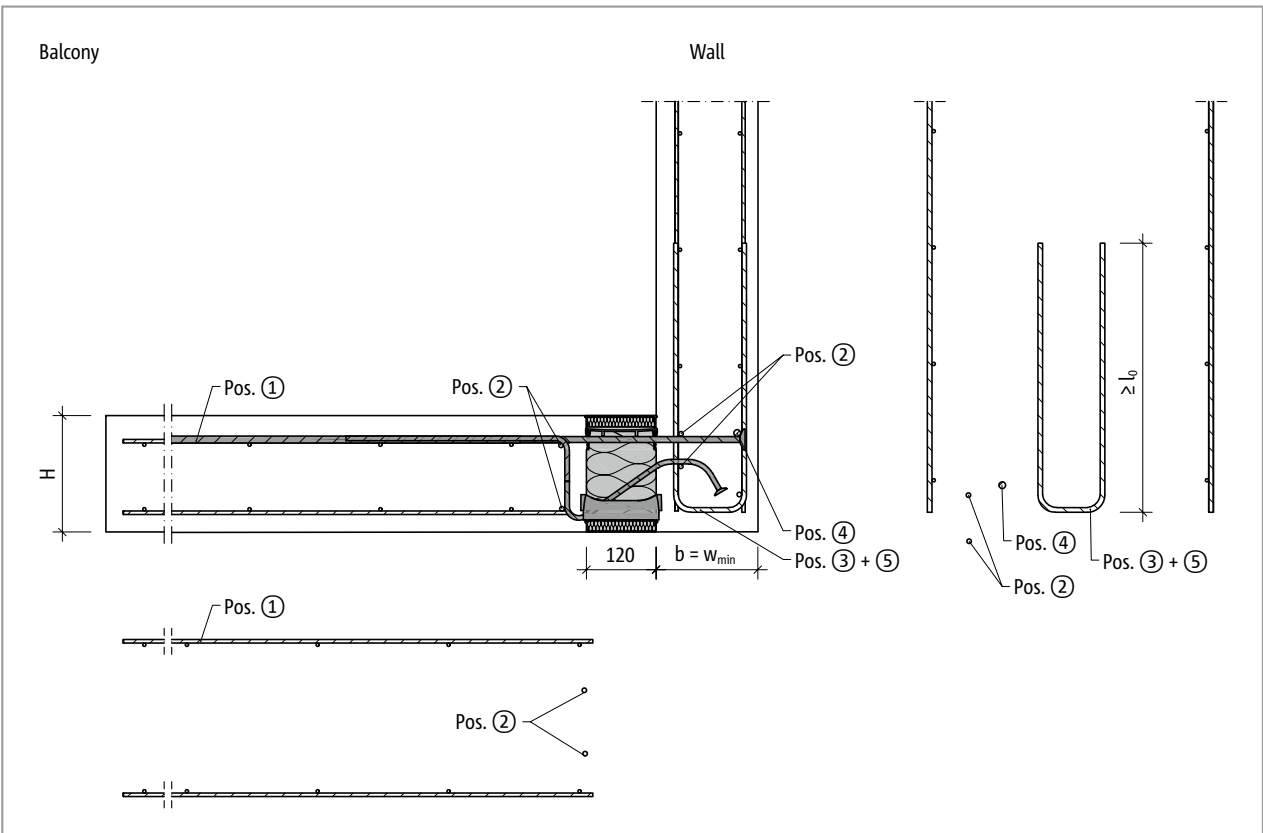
Schöck Isokorb® XT type K-U: On-site reinforcement for wall connection upwards with minimum structural element dimension ( $w_{vorh} = w_{min}$ )
